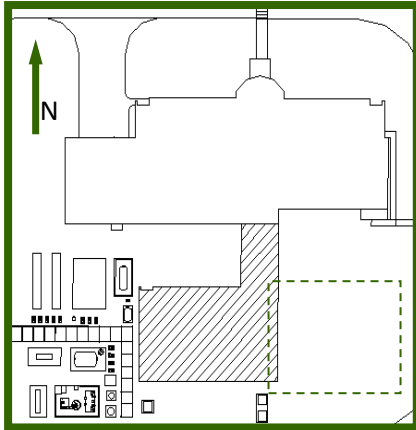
Site Plan. Courtesy of Project Engineer. This plan shows a portion of the campus footprint with the Production Building shaded. The future bays will be located in the dashed area.
